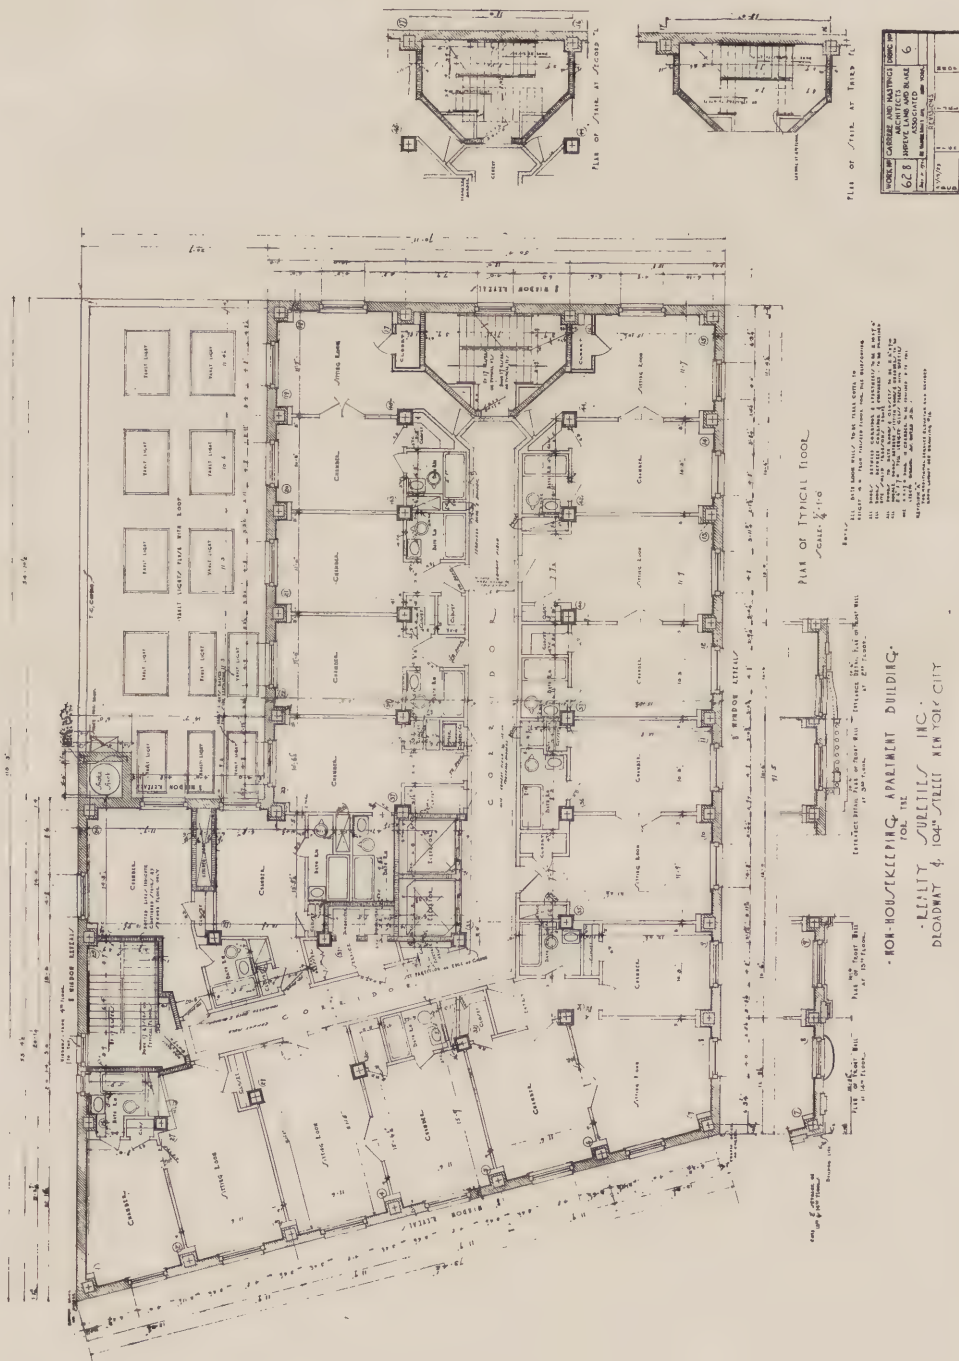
Plan of Typical Floor of Non-housekeeping Apartment Building for Realty Sureties, Inc., New York City. Carrere & Hastings, Architects. Shreve, Lamb & Blake, Associated.
